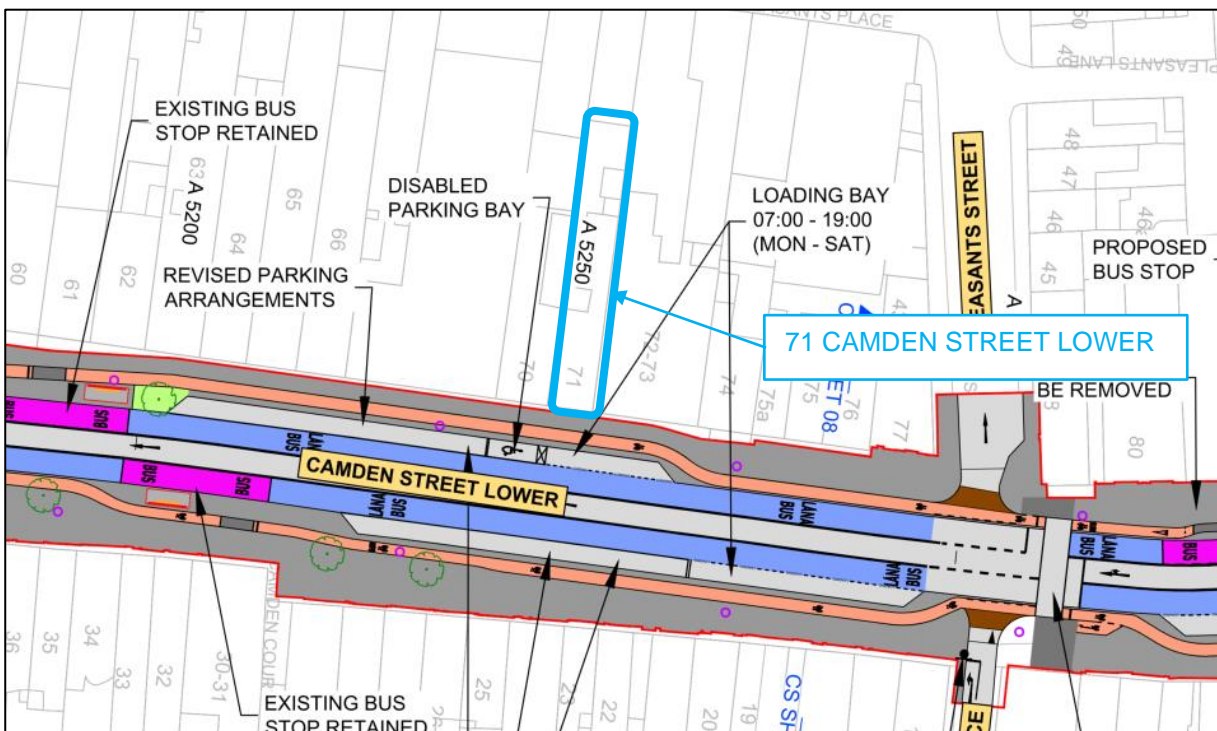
General Arrangement of Proposed Scheme adjacent to 71 Camden Street Lower (Sheet 16)
